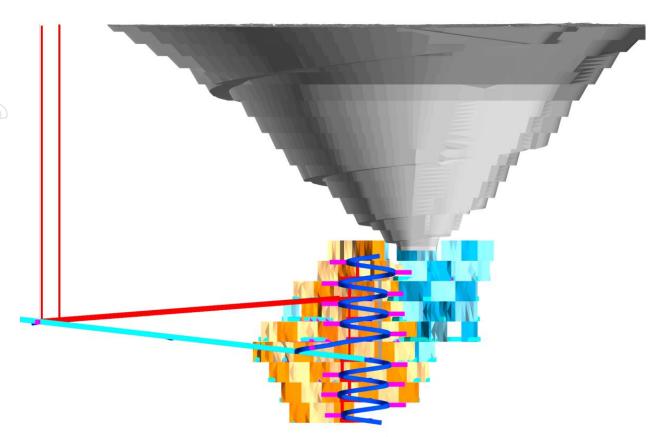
Isometric View of Proposed Roswell Pit and Underground Mine
